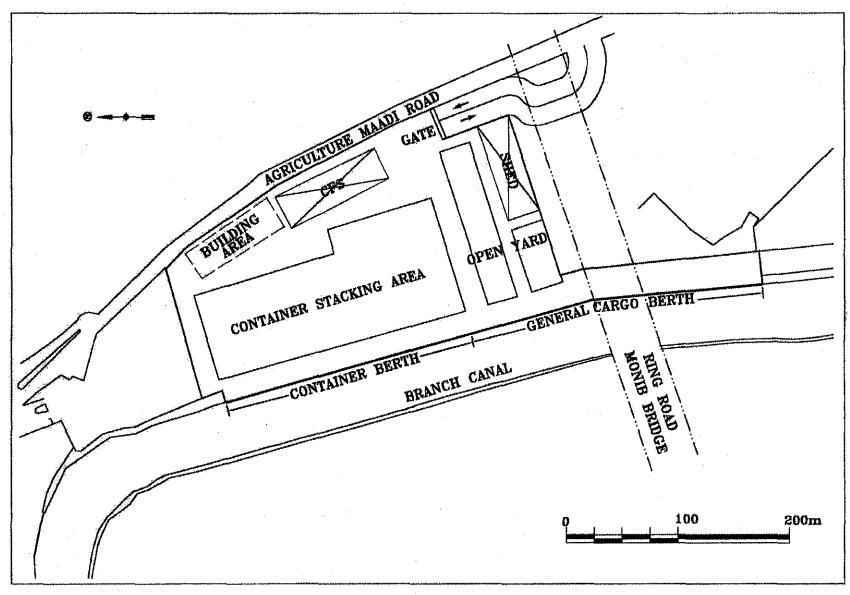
Layout Plan of Ather El Nabi Port
